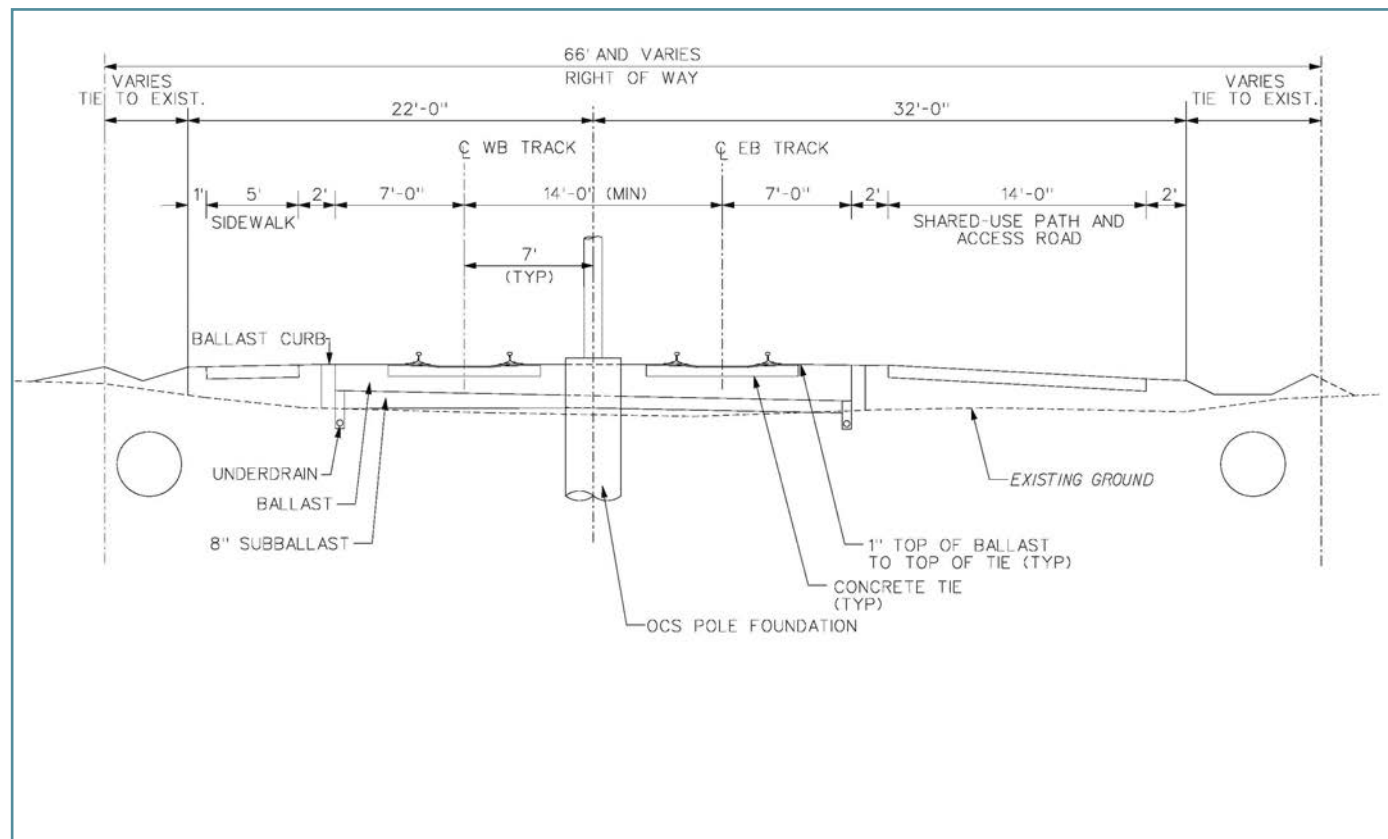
Typical Section – one 5-foot sidewalk and one 14-foot shared-use path
